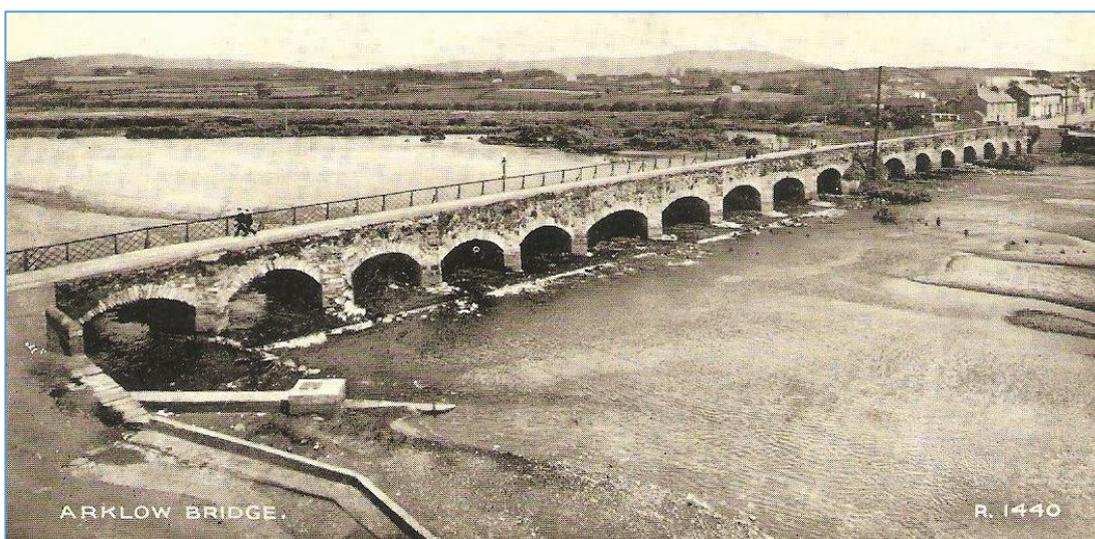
Historic photograph of Arklow Bridge taken from the west bank. Date unknown, Collection unknown. Source: ARUP.
